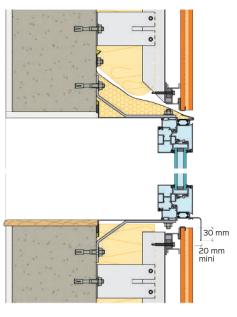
DETAIL : WINDOW FRAME FLUSH WITH INSIDE AND OUTSIDE WALL
